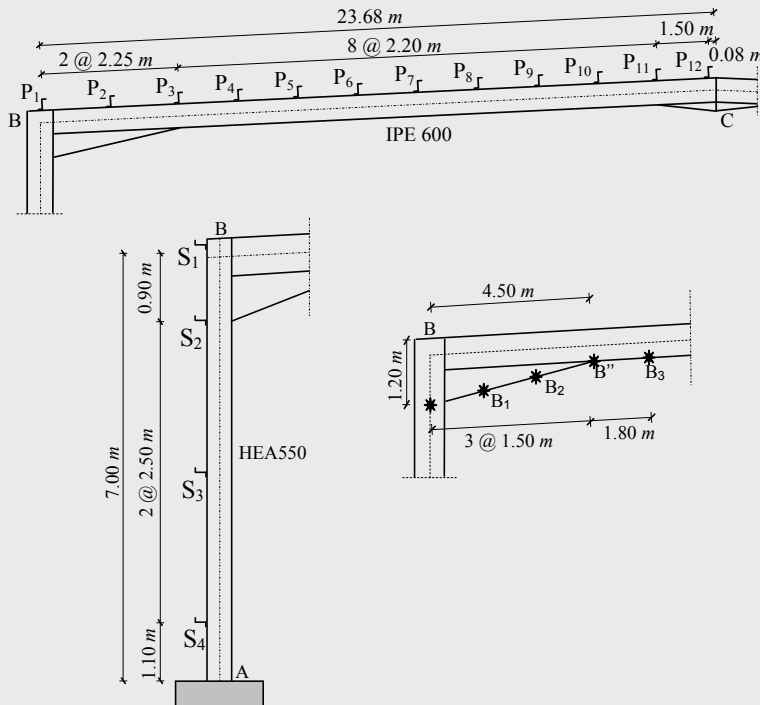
Detailing of column AB, rafter BC and position of additional effective restraints
